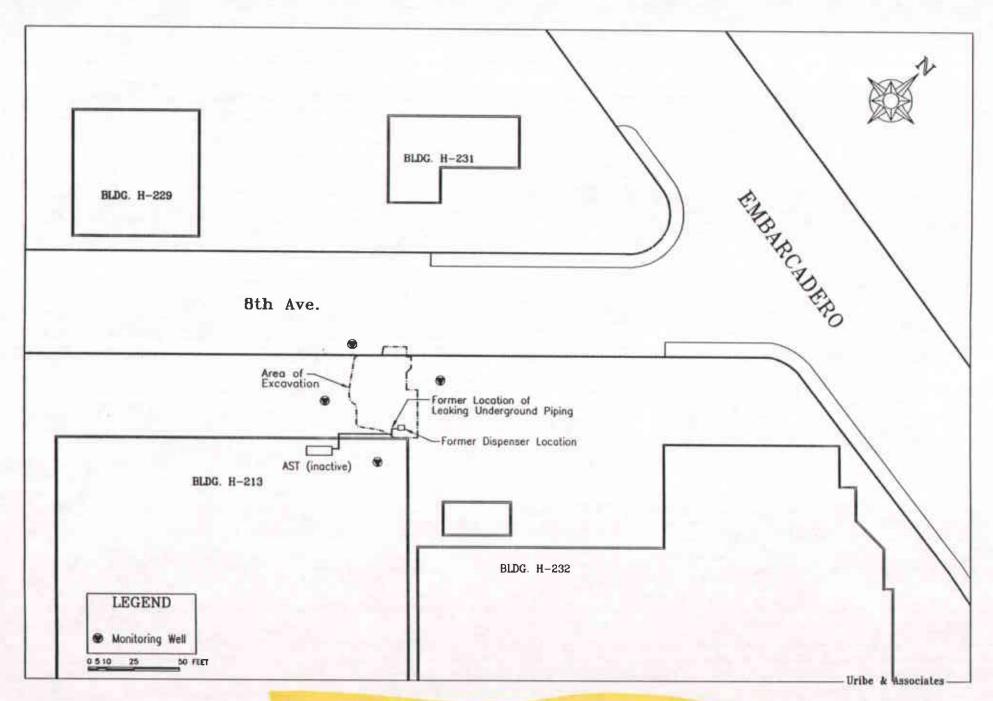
Site Plan Showing Proposed Monitoring Well Locations
